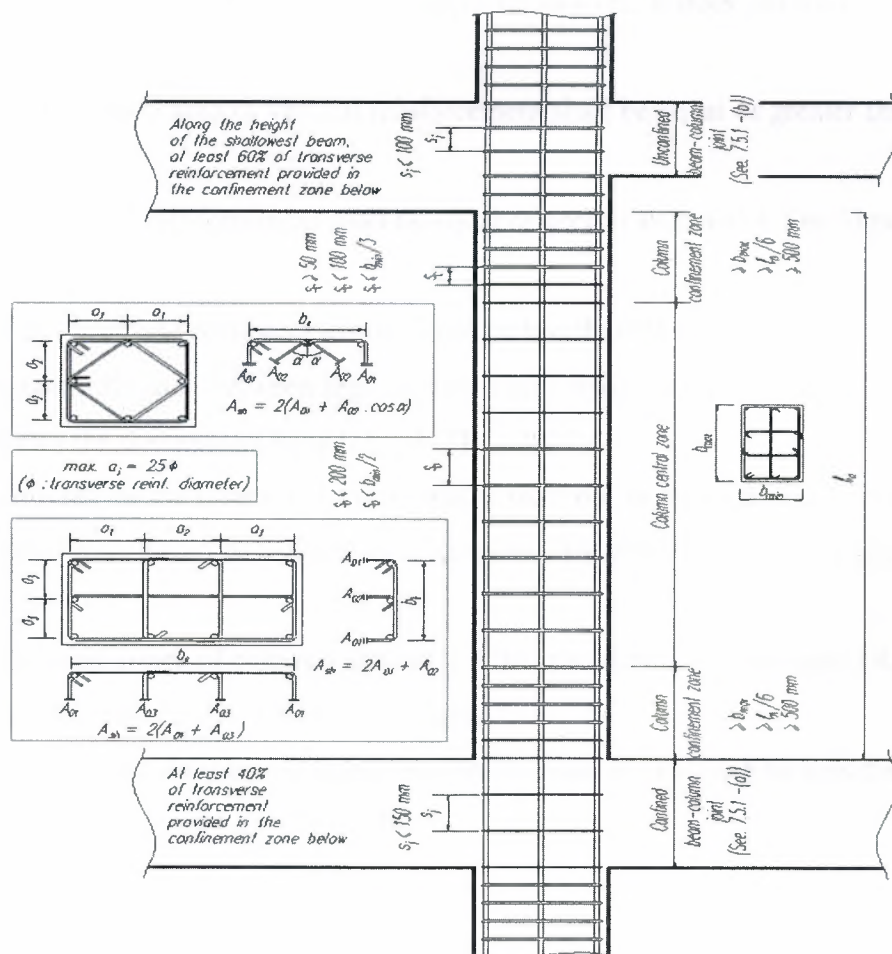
Column Confinement Zones and Detailing Requirements (TEC, 2007)
